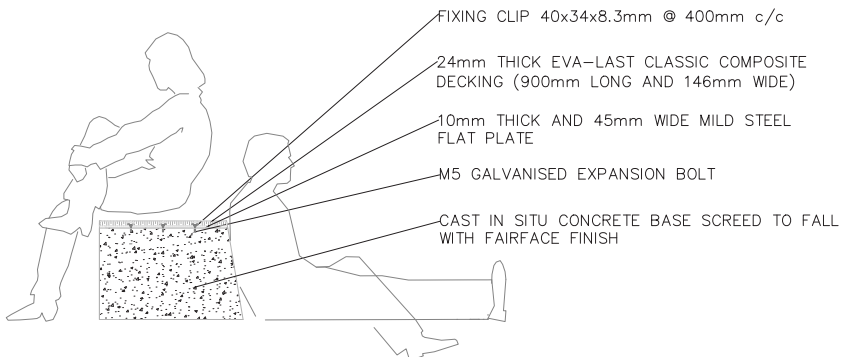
Detail 5.3-Composite timber and concrete bench fixing detail - not to scale (Author: 2013)
